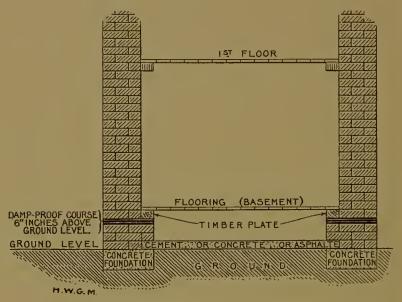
Section of Foundations, Outer Walls, Damp-proof Course, and Flooring of House.
